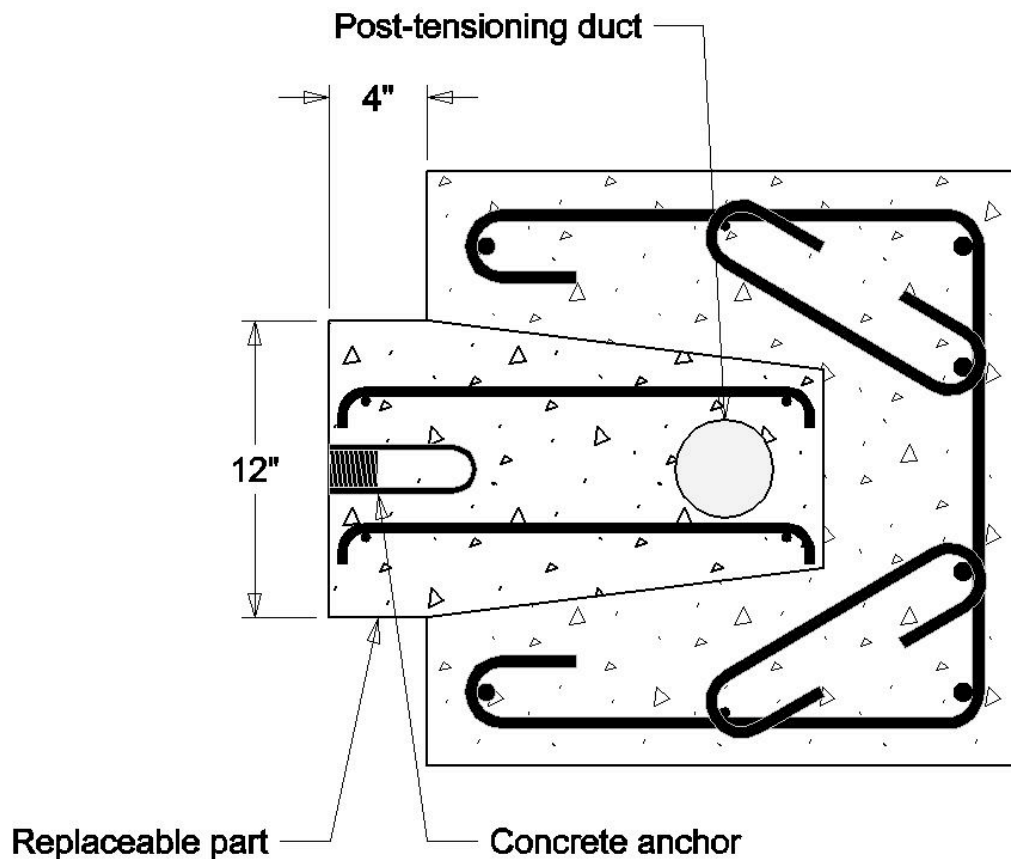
Plan View of Beams (Icaza 2004)
